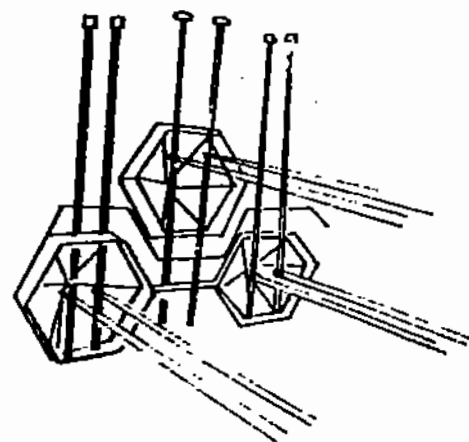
SLIDING METHOD OF CONSTRUCTION
